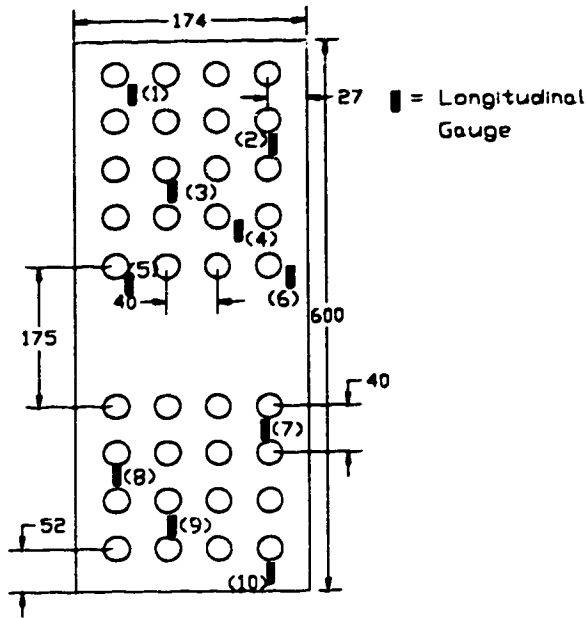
Strain Gauge Layout on Side Plate for Specimen C4
